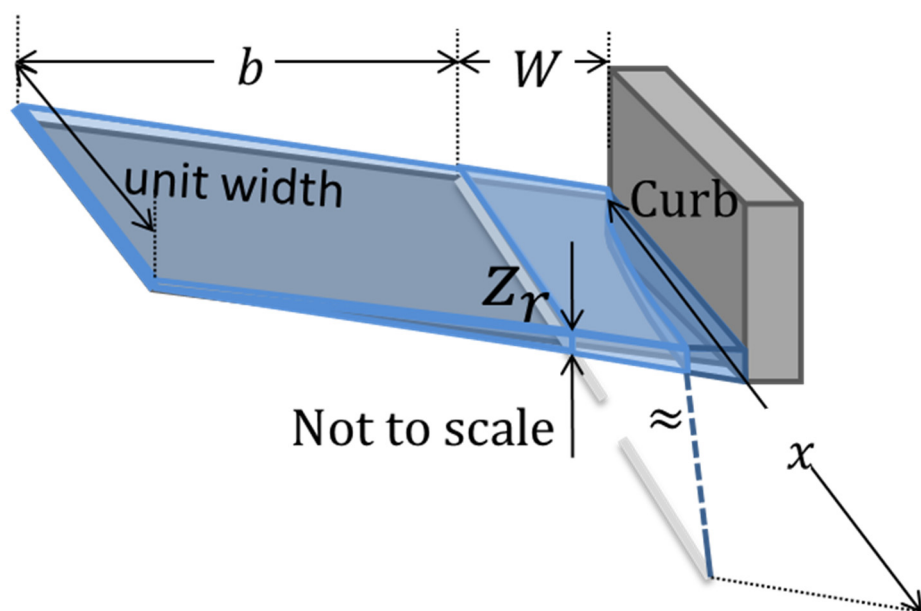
Roadway section with hydroplaning depth and inlet spacing shown.
